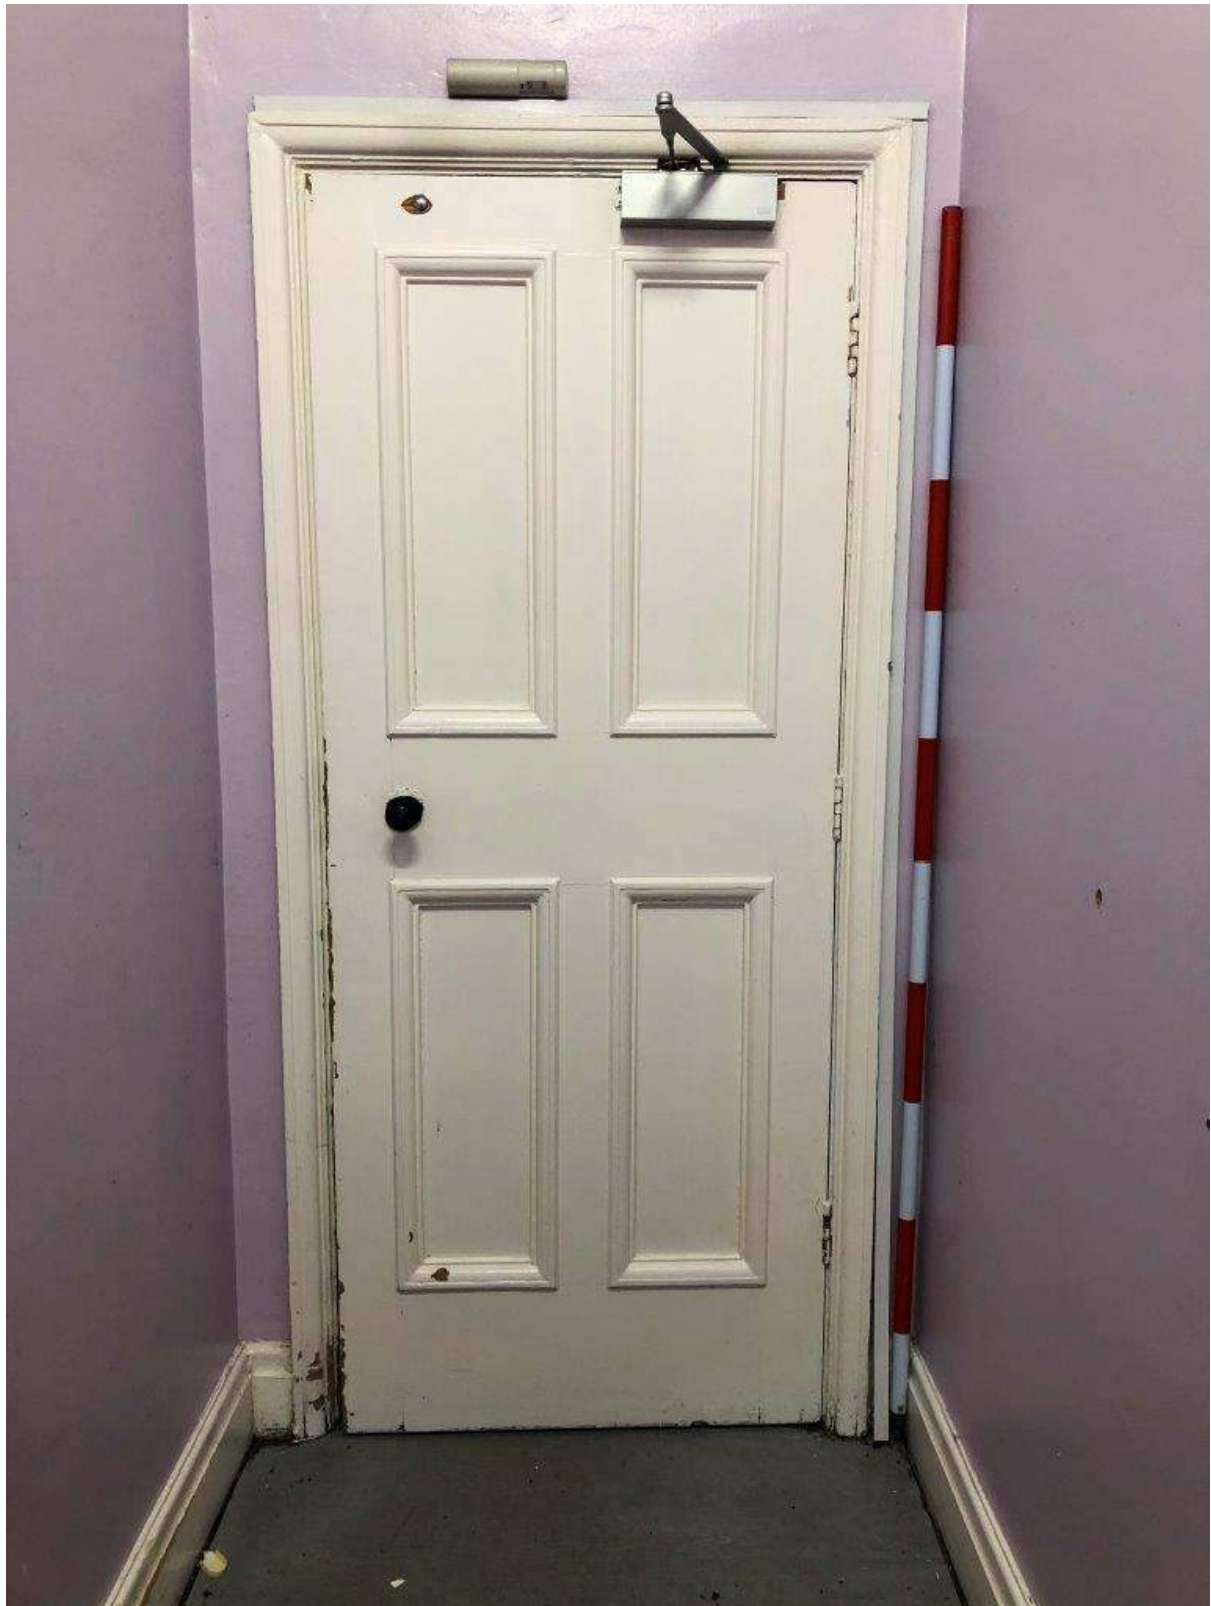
Sightline from the service corridor which runs east-west in the southern wing to the doorway into a lounge. This doorway would be stopped up and the wall on the right removed to create the Men's WC. Fabric impact would include s brickwork, plaster, wallpaper and skirting board. Scale = 2m.
